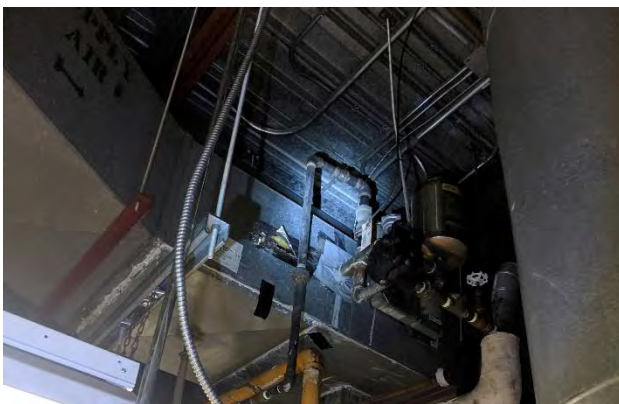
AHU-1 Steam Section with Ductwork Tear Visible
